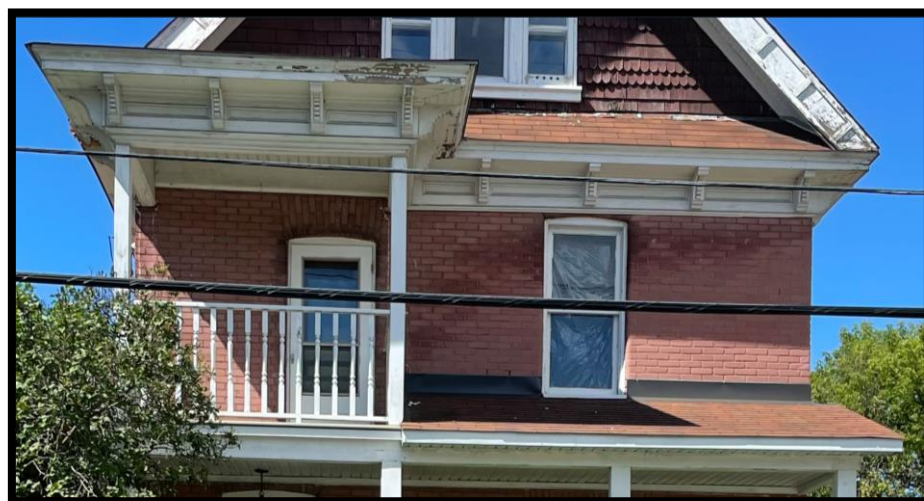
Second-storey portico, 366 Winona Avenue, showing the depth and detailing of the portico roof what should be a secondary element in the building's architectural hierarchy. The photo also shows the ghosted marking on the brickwork of what was likely the original shape of the posts supporting the portico and porch. Credit: Matrix Heritage, 2022.
